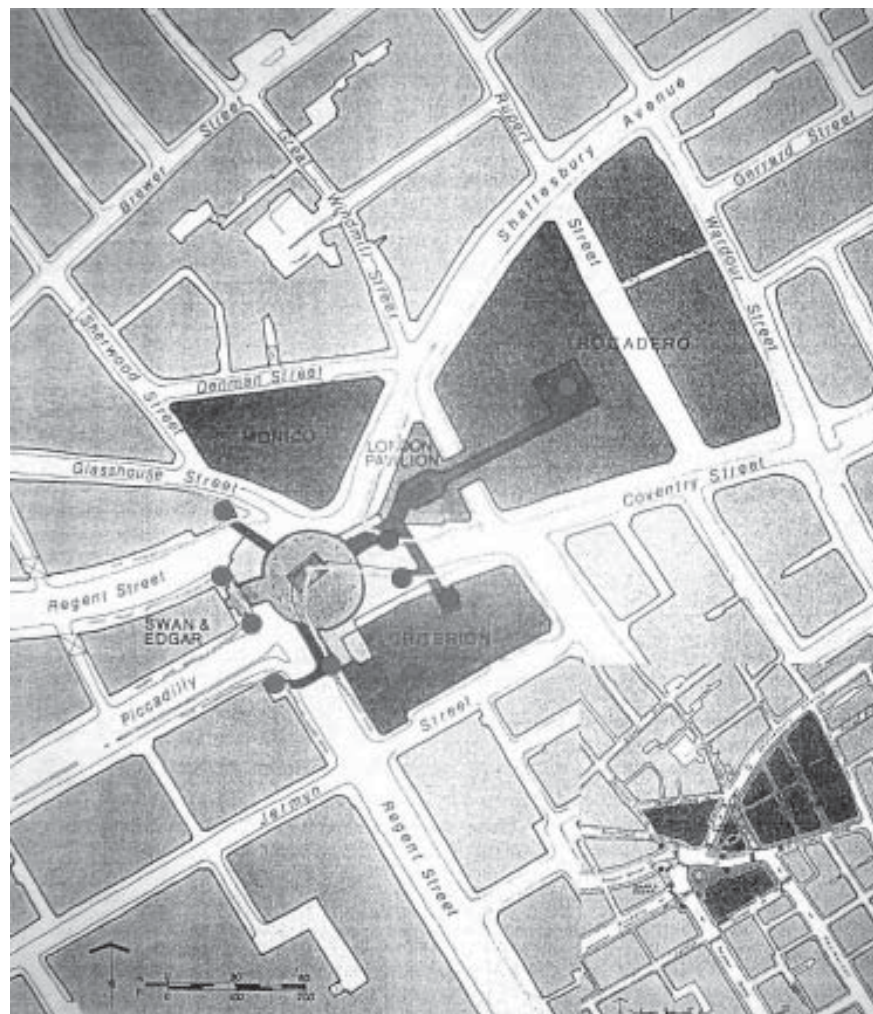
Access points at Piccadilly Circus Underground station (LUL 1996)
